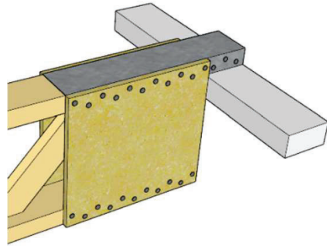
The billet truss can be cut arbitrarily, if the cutting point does not match a node point a reinforcement is needed. The upper support reinforcement is realized by fixing OSB-panel and steel U-rail.
